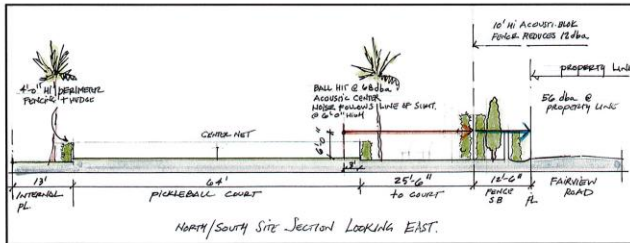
Site section (north to south) of proposed pickleball courts (refer to attached Site Plan).
